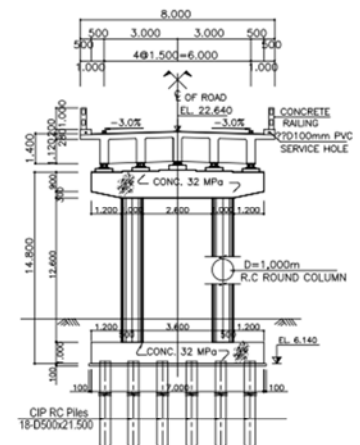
Typical Cross Section of Bridge (RC T-beam)
